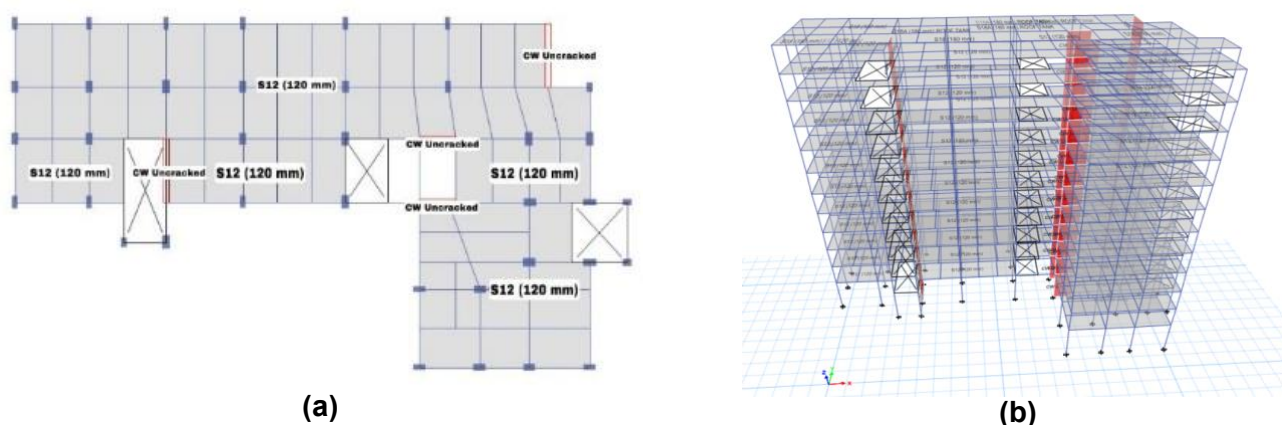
X Building modeling results (a) structural plan (b) 3D model of the structure
